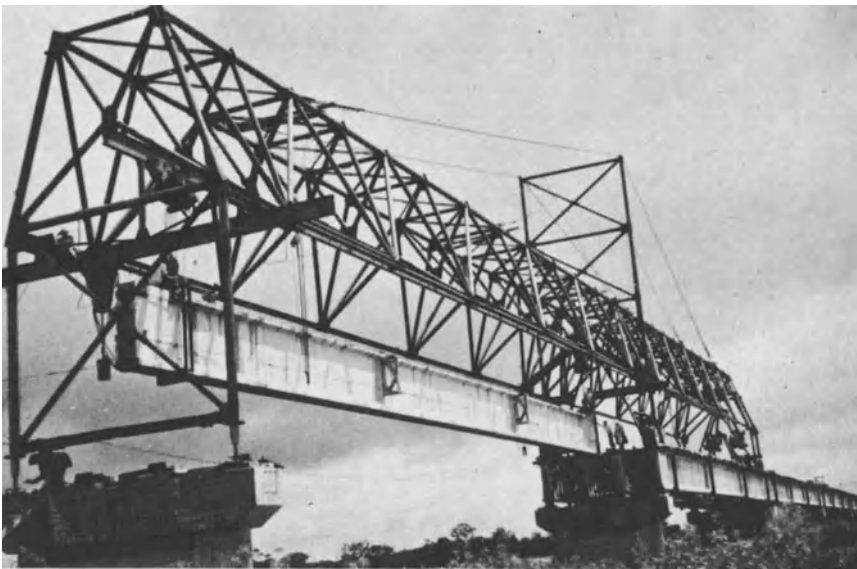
Girder launcher erecting a 70-ton, 130-ft-long girder in Bolivia.
